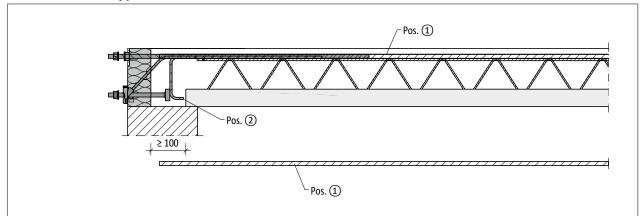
Schöck Isokorb® T type SK-M1: On-site reinforcement for semi-precast construction: Cross section
